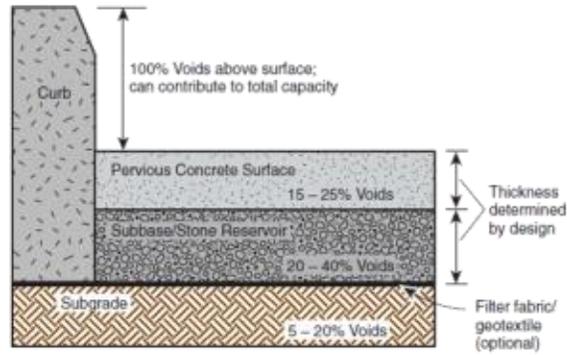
Configuration of pervious concrete pavement (Adapted from Tennis et al. (2004))
